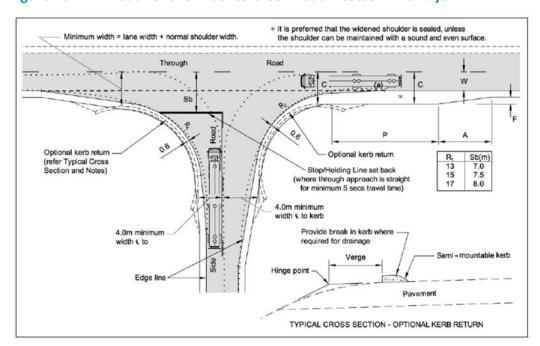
BAL Treatment for Rushes Creek Road Access Driveways
